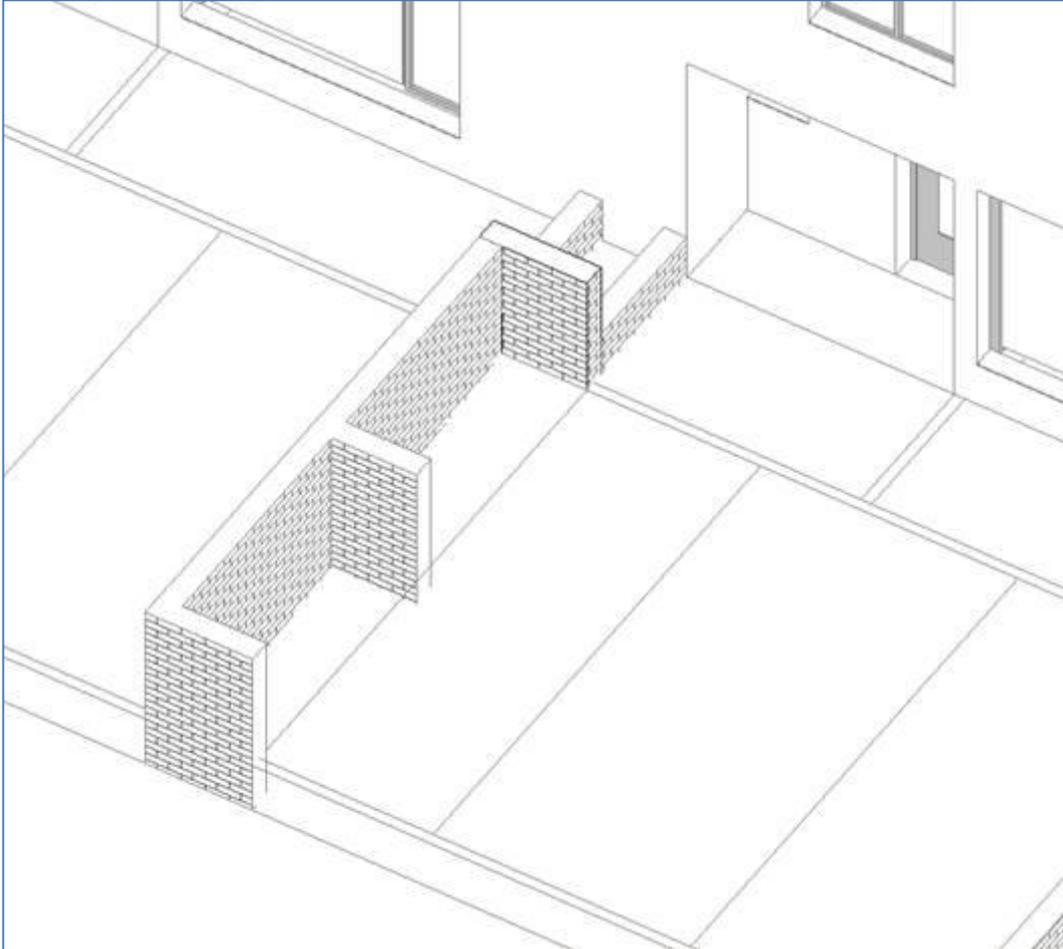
Concept Isometric Detail for Proposed Bicycle Store at Houses
